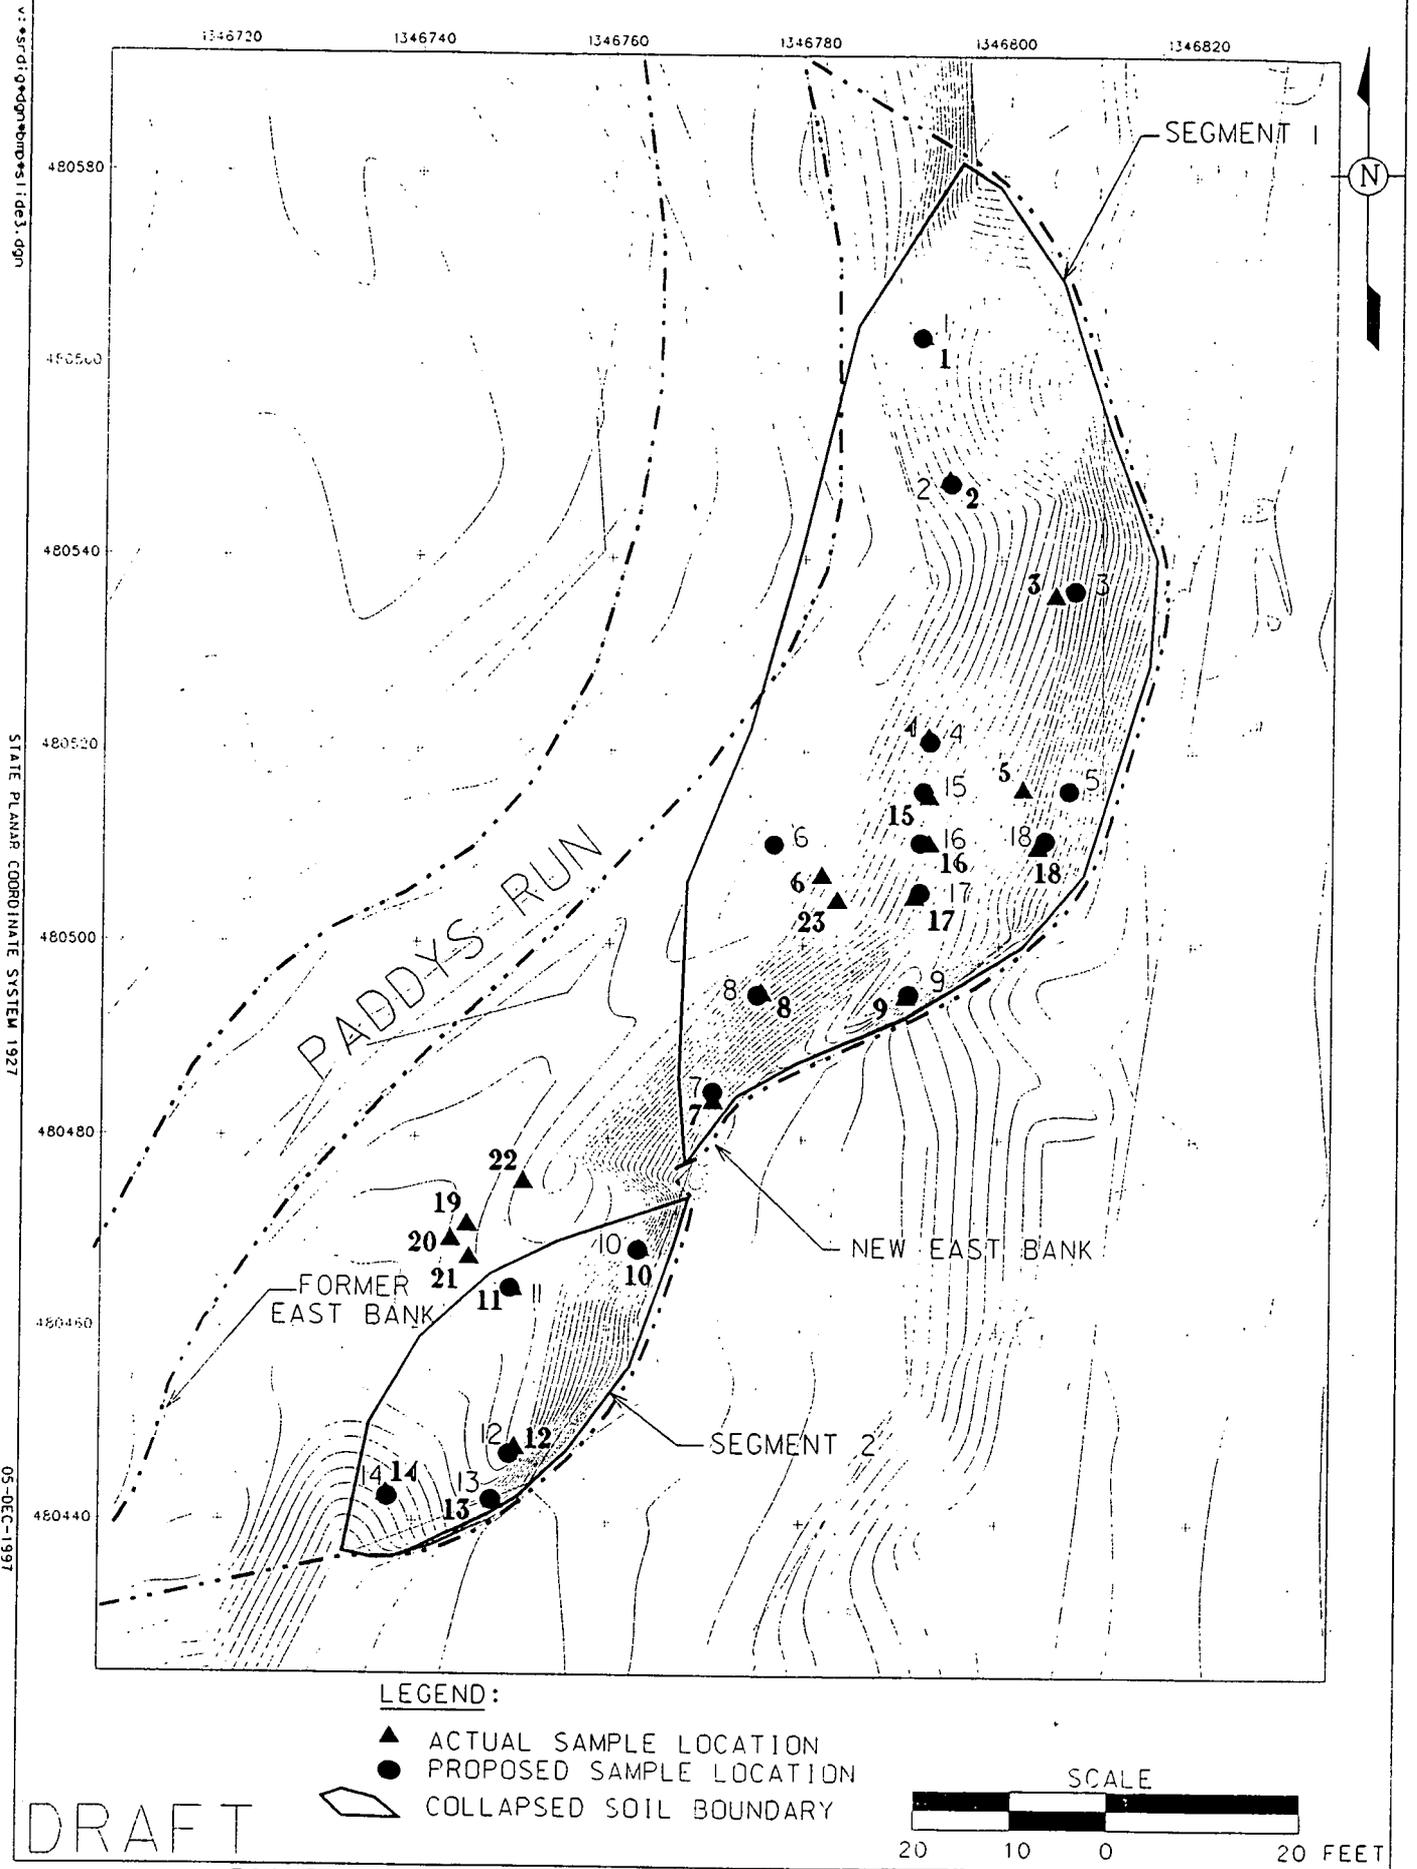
PROPOSED AND ACTUAL SAMPLE LOCATIONS IN PADDY'S RUN EMBANKMENT STABILIZATION PROJECT
